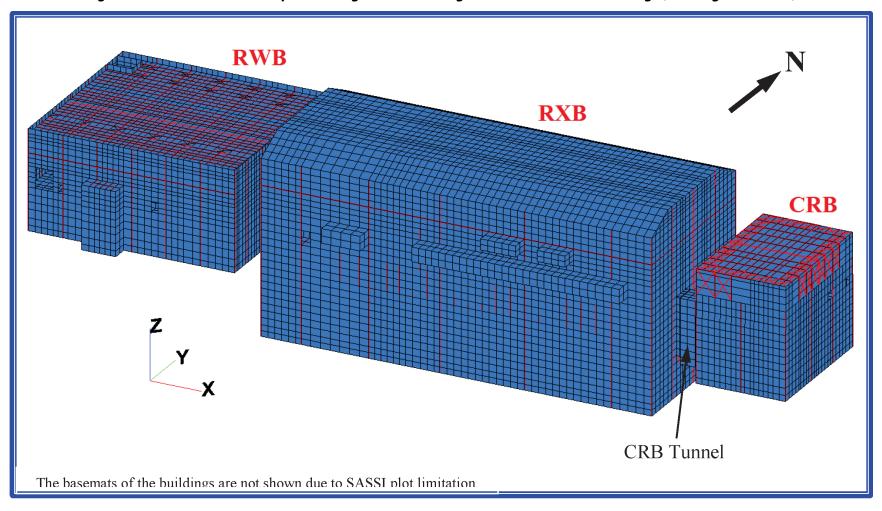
SASSI2010 Triple Building Model Showing North Side of Three Buildings (Looking Southwest)
